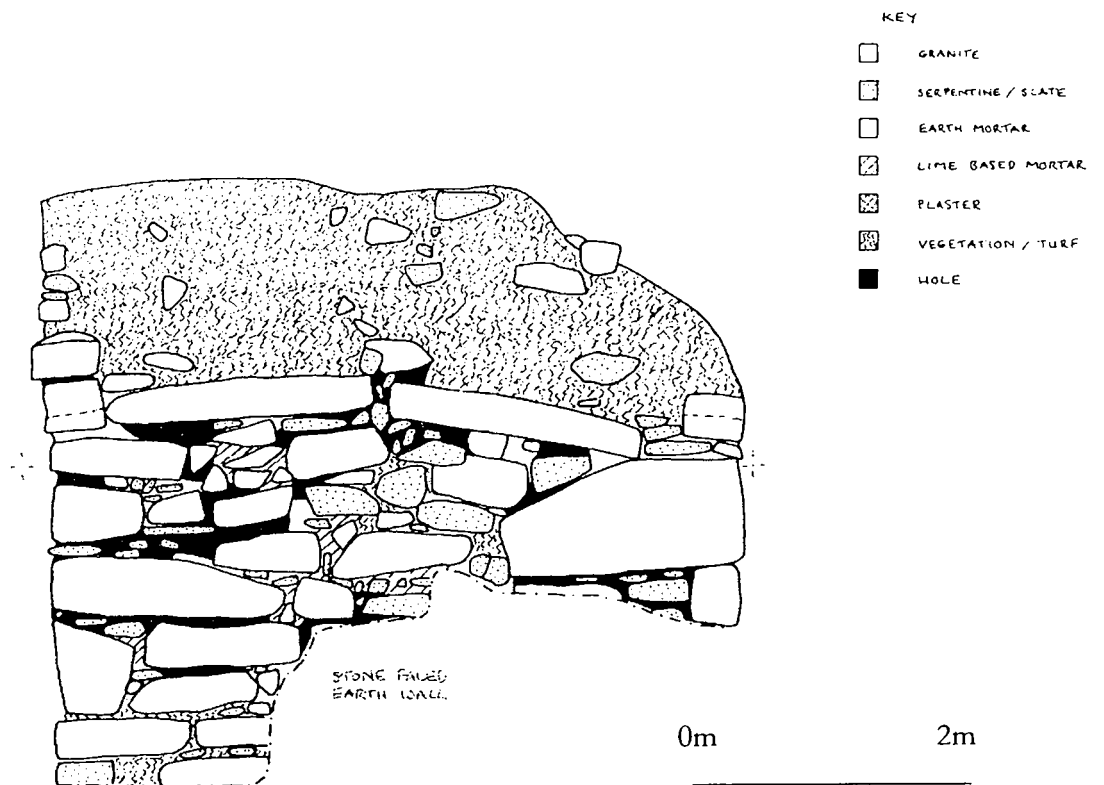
Exterior north-east elevation of Trelill Holy Well (by Jo Sturgess)
